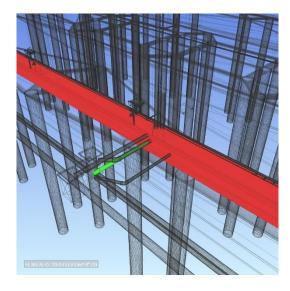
Clash Detection 3D View, a. Clash of pipe with RCC wall, b. Clash of pipe with grade beam.
